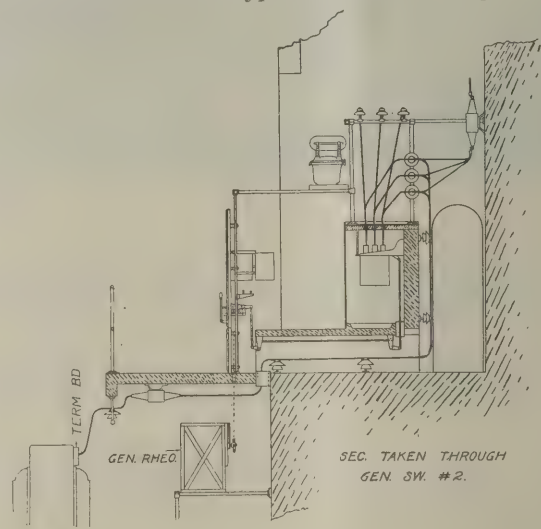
ARRANGEMENT OF SWITCHING APPARATUS.
